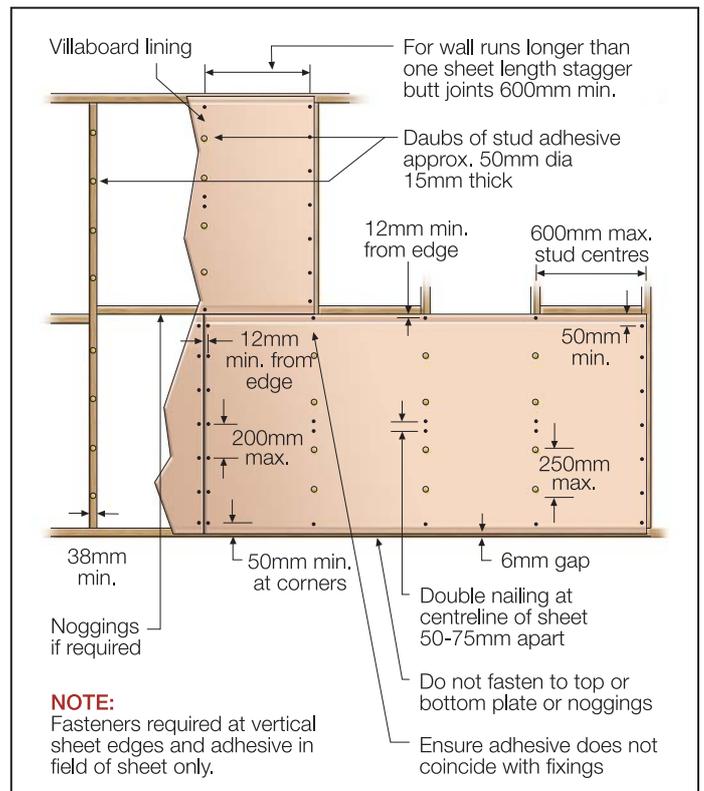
FASTENER / ADHESIVE FIXING TO WALL FRAMES
